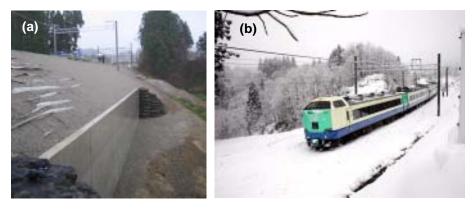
Reconstructed geogrid-reinforced soil (GRS) retaining wall at Site 1 with a full-height rigid facing built using the staged construction method: (a) 5 December 2004, photo taken by F. Tatsuoka; and (b) the first train running on the wall, 26 December 2004 (photo is courtesy of East Japan Railway Company).
